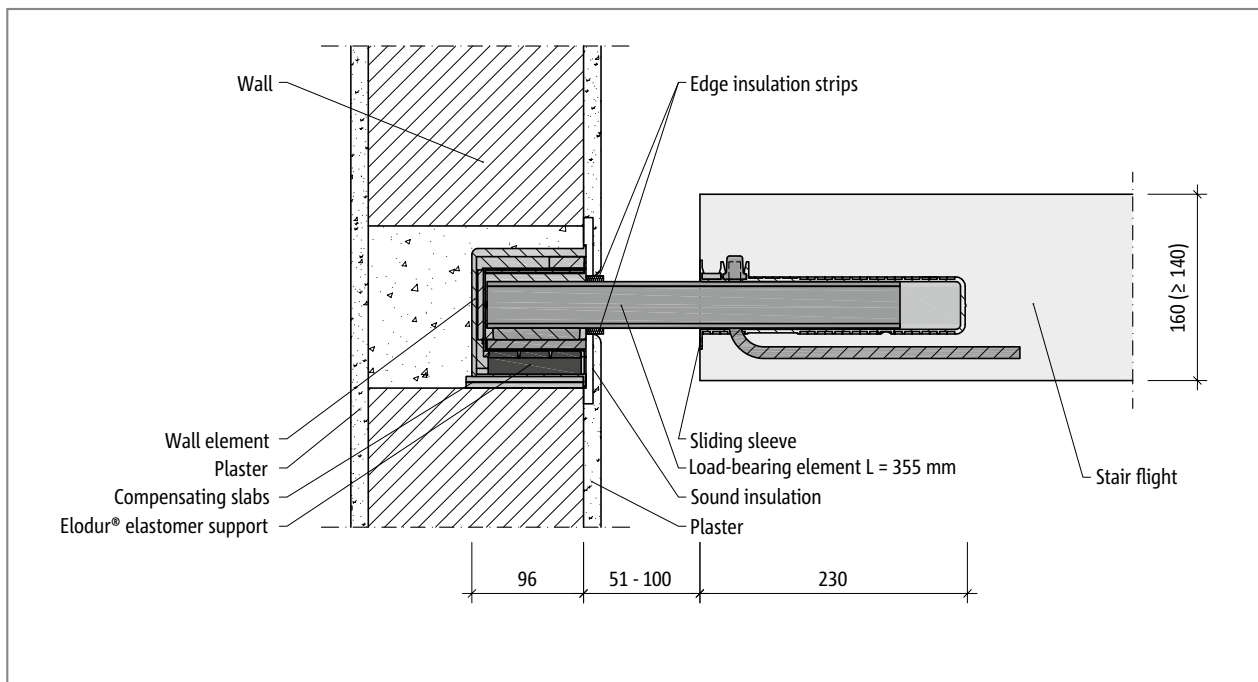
Schöck Tronsole® type Q-FV-XL or Q-A2-XL: Installation cross-section with precast stairs flight
